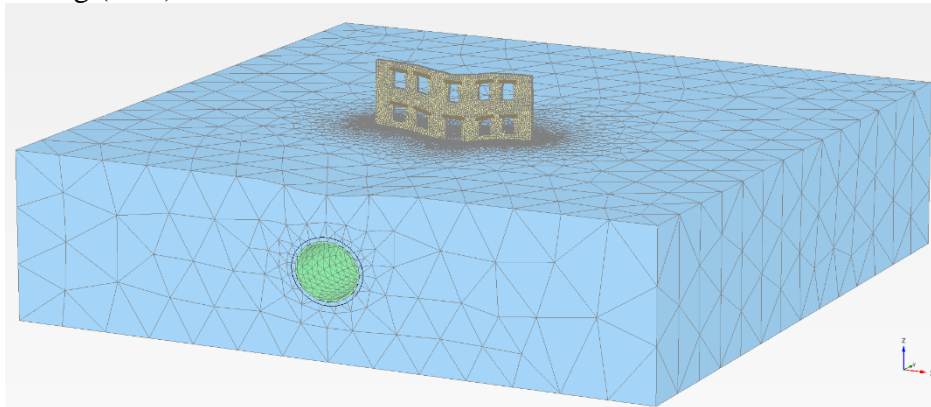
Deformed mesh for the tunnelling analysis of a masonry wall with opening.
